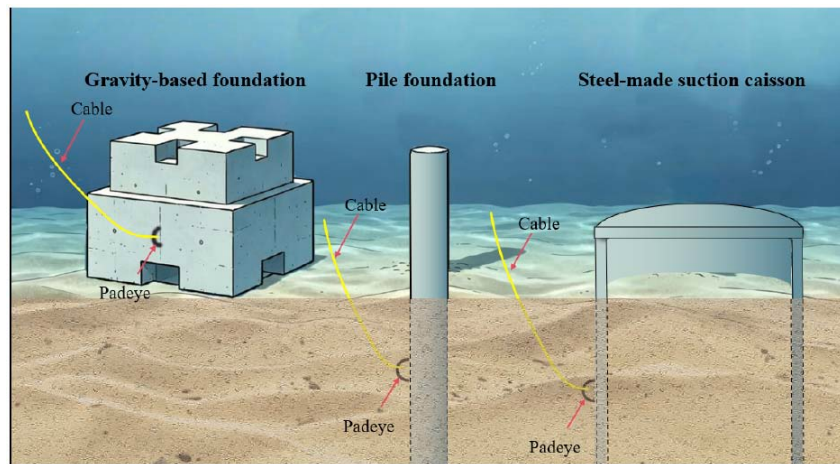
Diagrams of the gravity-based foundation, the pile foundation and the steel suction caisson.
